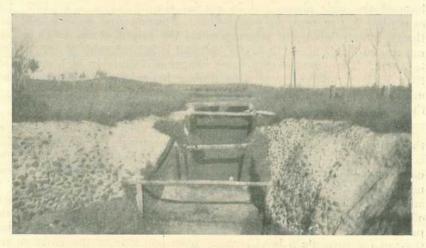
A Wood and Masonry Structure Used to Stabilise a Deep Gully.
